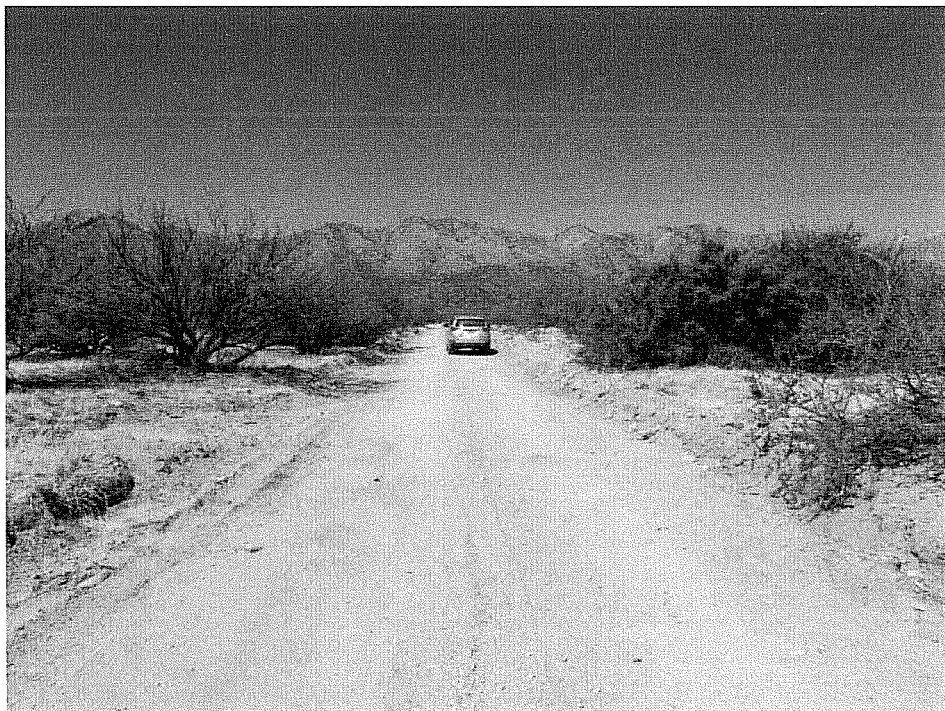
VIEW EAST ALONG LAS DELICIAS RANCH ROAD
